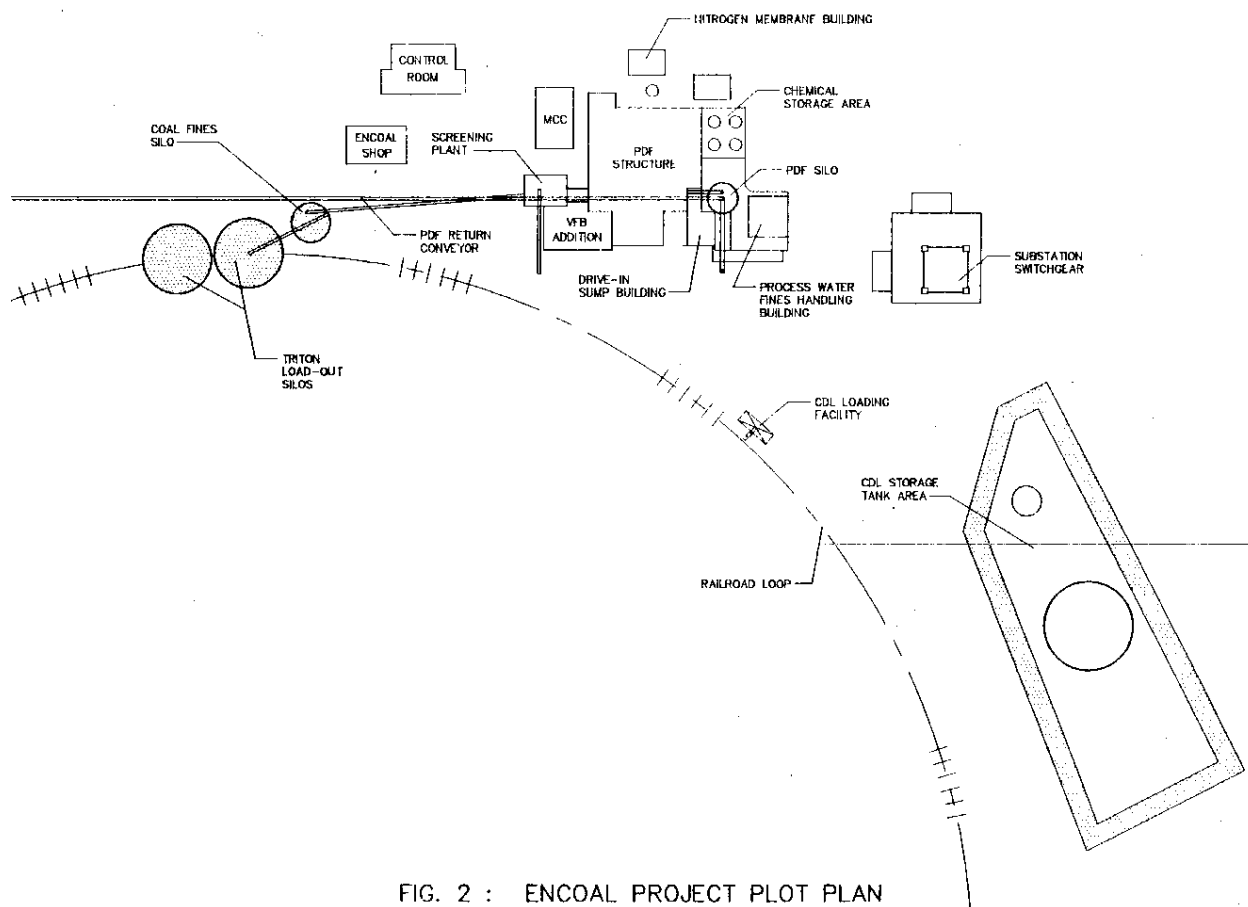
ENCOAL PROJECT PLOT PLAN
